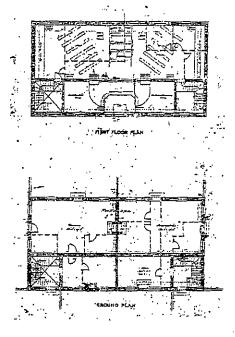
Early plan of ground and first floor of Administration building. The Chapel upstairs and offices/hospital on ground floor. (DPW&S Plan Room PC 321/146 c1867 - unclear)
